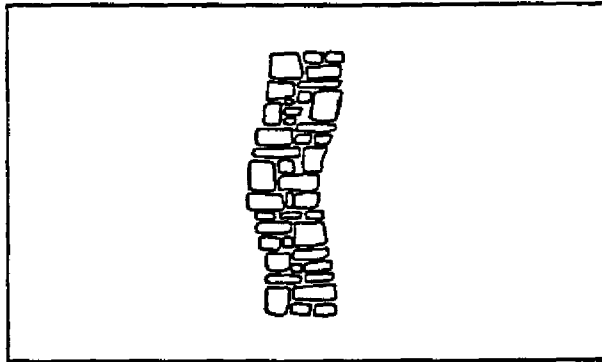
Lateral Distortion on Both Sides of Masonry Wall. [3]
